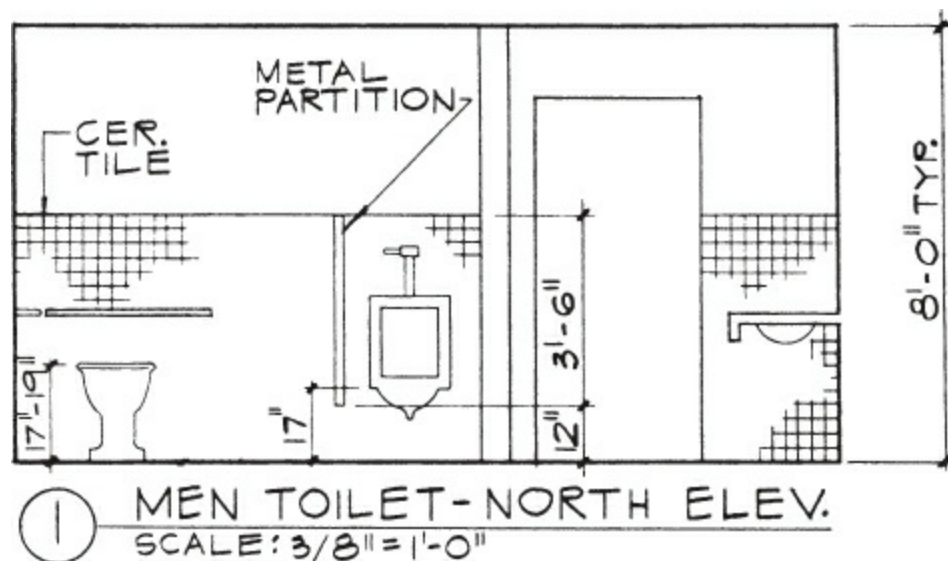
(#) shows a partial floor plan for the lobby and restroom area of an office building. [Figure 11.84](#) shows the north elevation of the men's toilet. Because this is a public facility, access for persons with disabilities is shown on both the partial floor plan and the interior elevation.
